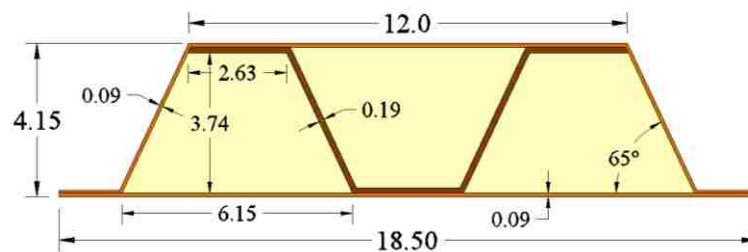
Schematic of mid-scale panel cross section (all dimensions in inches, 1 in. = 25.4 mm)
